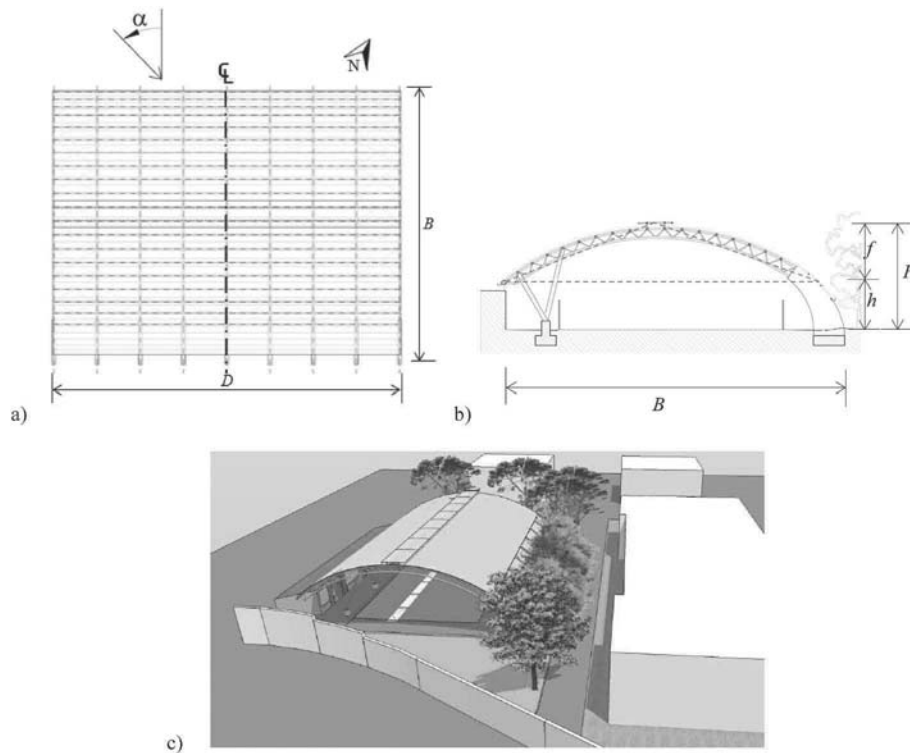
Plan (a), vertical section (b) and 3-D rendering (c) of the proposed roofing structure.
